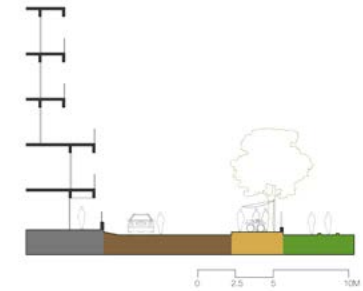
CMH Park and 9TH A Main Road : Proposed Section
